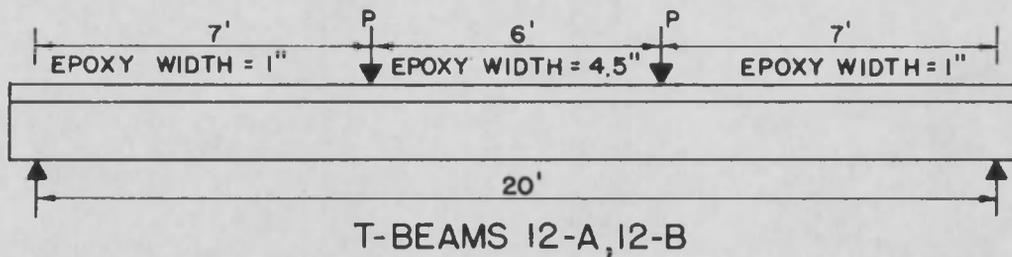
LOADING ARRANGEMENTS FOR T-BEAMS
